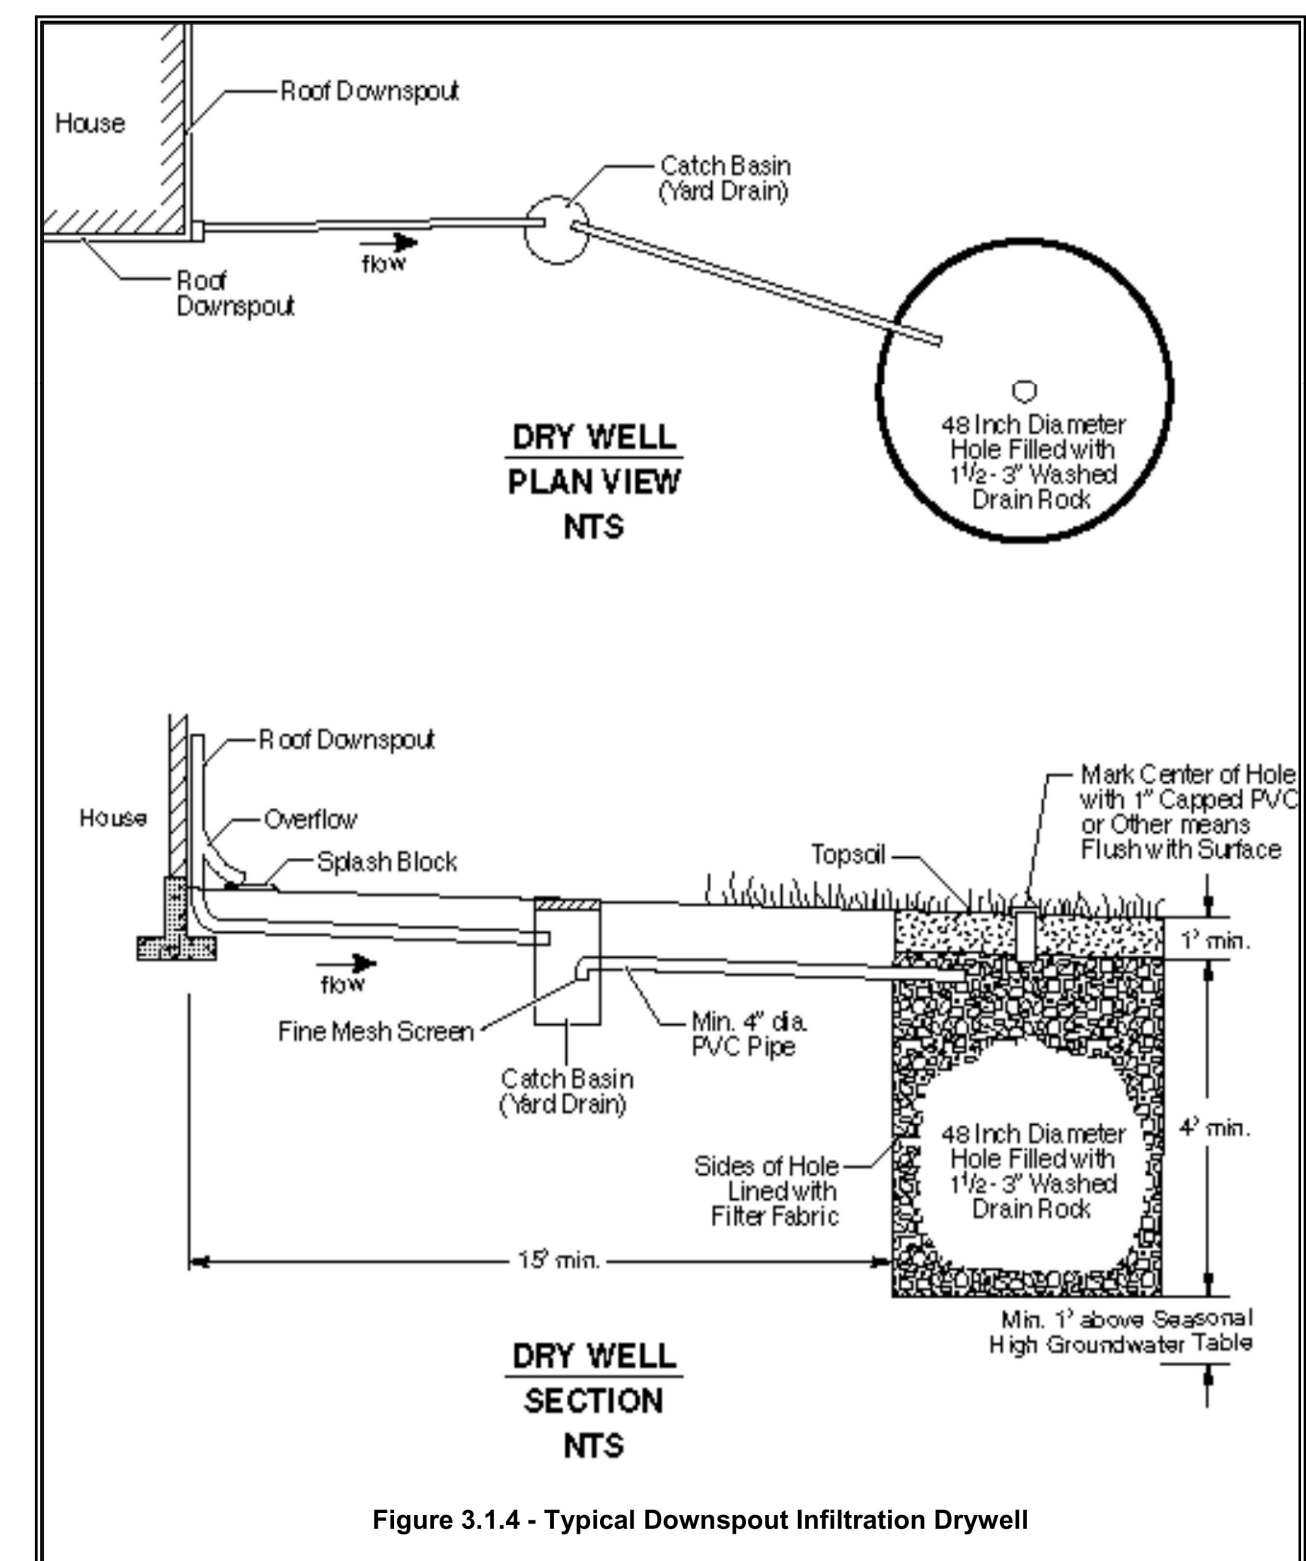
Typical Downspout Infiltration Drywell
